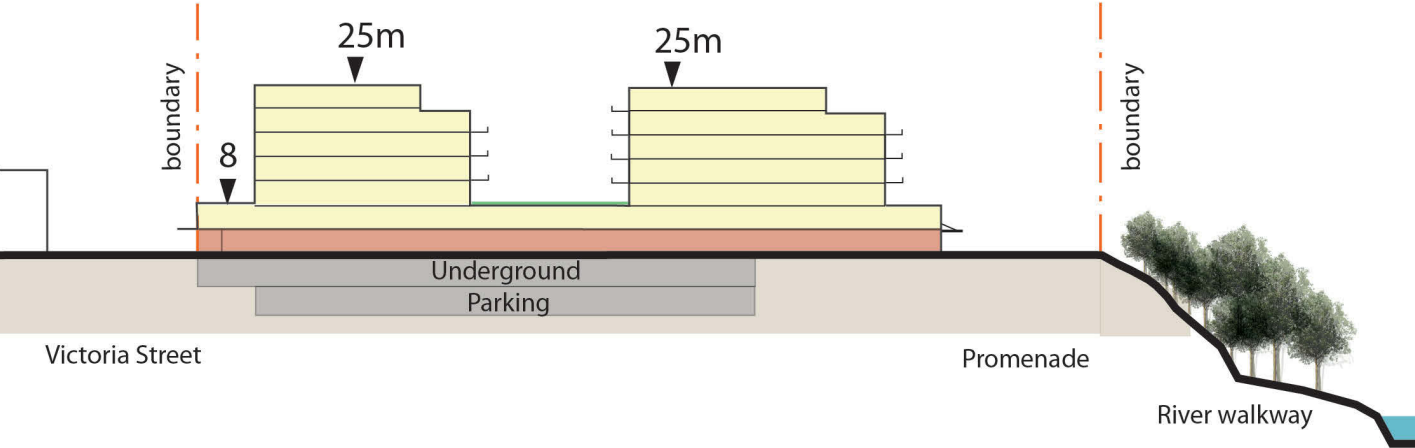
Indicative concept section A-A for Development Site 3 (not to scale)
